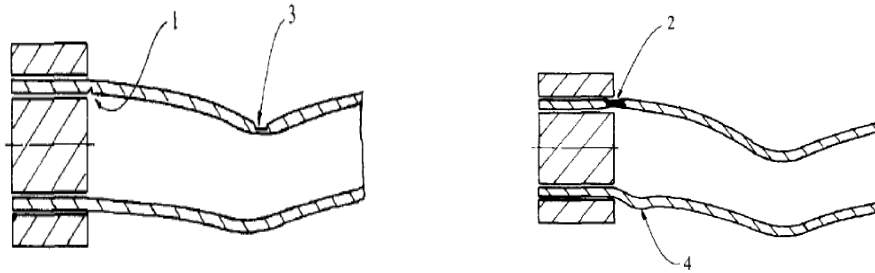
Failure modes exhibited by pipe-specimens [Jones *et al.* (1992)].
